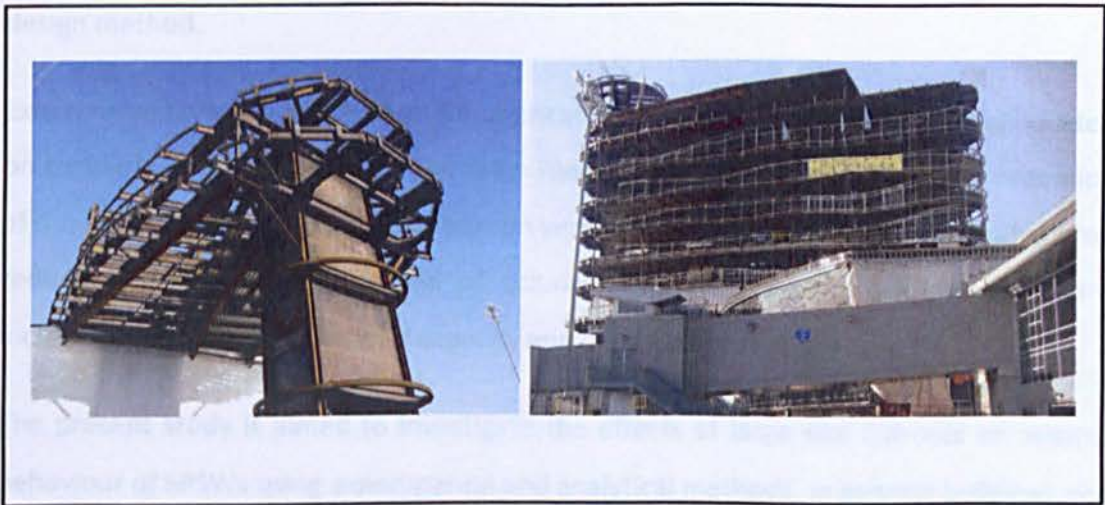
Construction of Edmonton International Airport's control tower with steel plate shear wall system in Canada (Courtesy of Ellis Don Inc)
